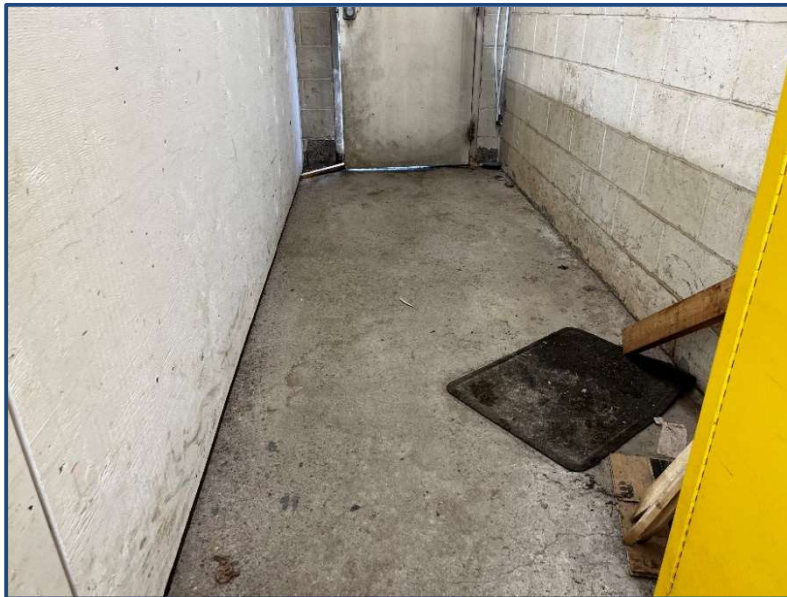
Garage No. 1 Concrete Slab – Map Cracking and Wear by Garage Door
